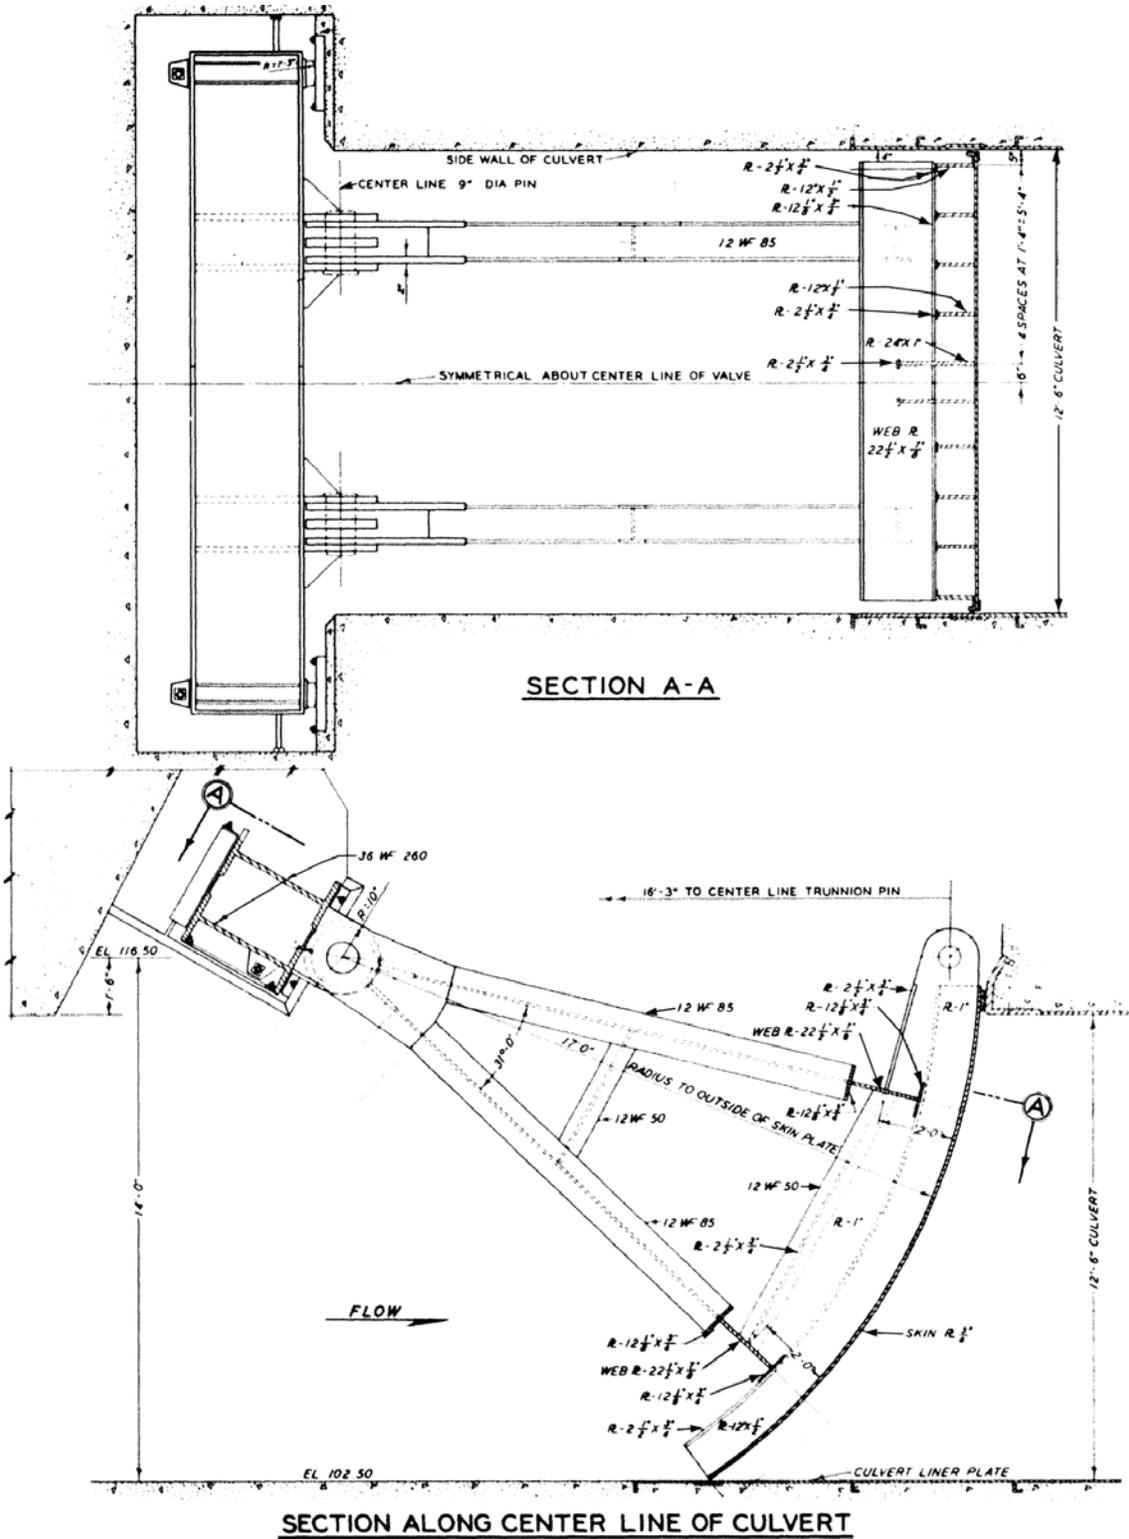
Tainter Valve, Holt Lock, Type 5 Design.
